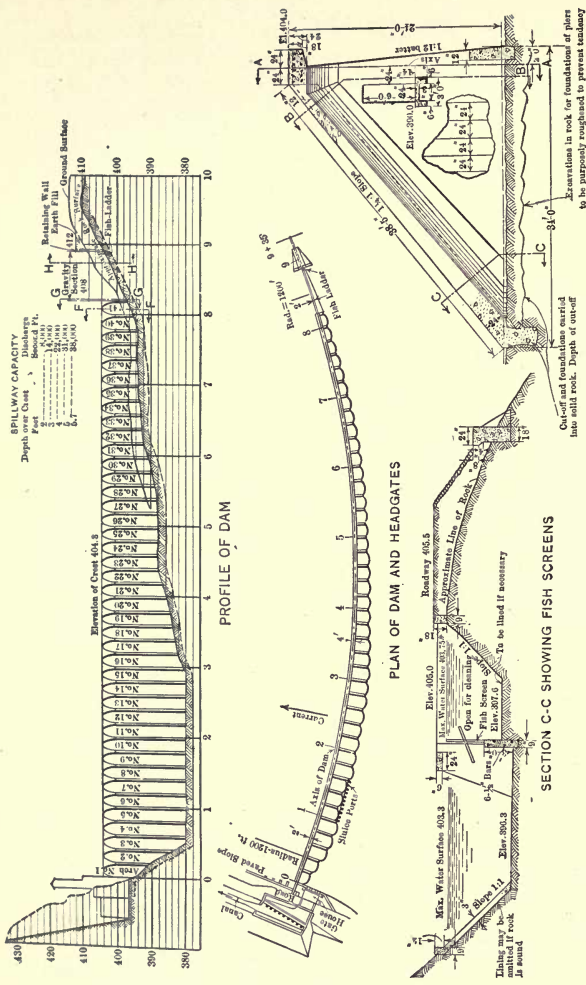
Elevation, Plan, and Section, Three Miles Falls Dam, Umatilla River, Oregon.
